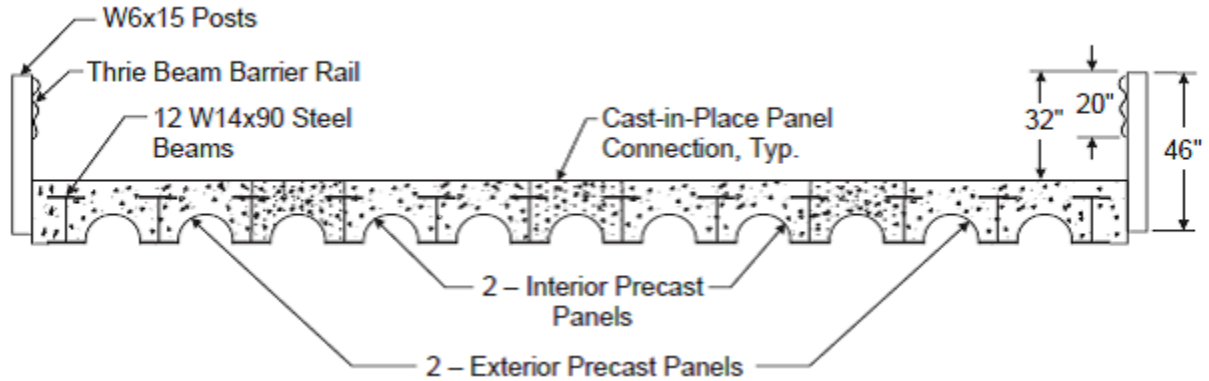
Modified precast beam in slab system (Konda et al., 2007)
